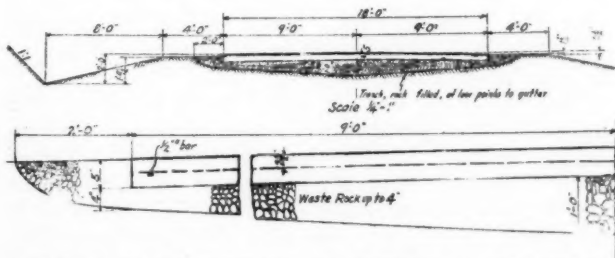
HALF-SECTION OF SECTION A, SHOWING ROCK FOUNDATION
